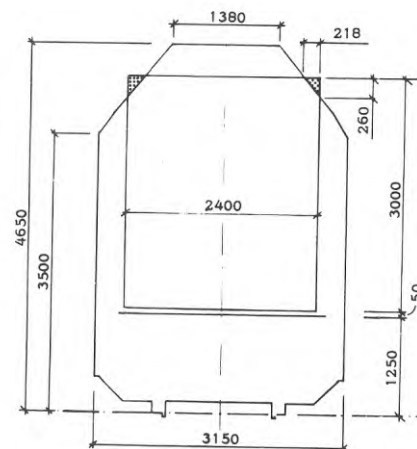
West German loading gauge showing example of load, parts of which are outside the gauge. Height of platform (standard waggon) 1250 mm, height of packing 50 mm, house section: height 3000 mm and width 2400 mm. Maximum possible height inside the gauge is 2790 mm.
